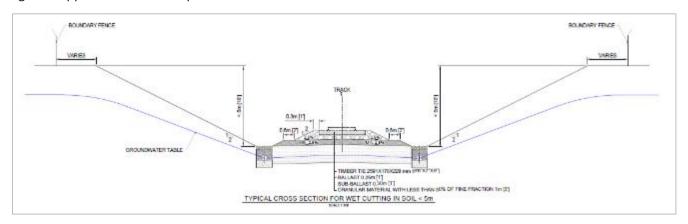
Typical Cross Section for Wet Cutting in Soil < 5m
